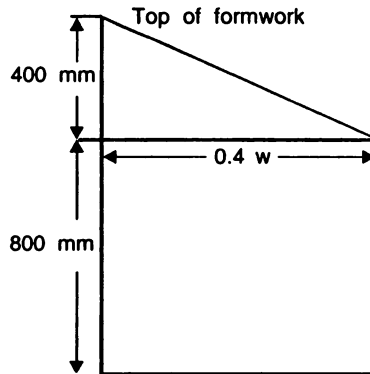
Lateral pressure on formwork due to placing of concrete (w = unit weight of fresh concrete).
